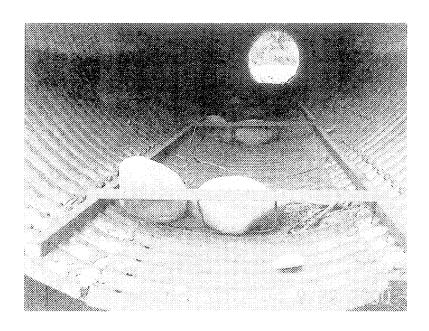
Fishway structure inside the western culvert with added center rock supports.
